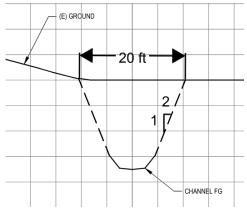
Typical new channel geometry in Palco Marsh
